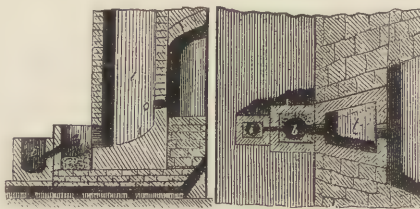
ELEVATION AND PLAN OF TIN BLAST FURNACE.
